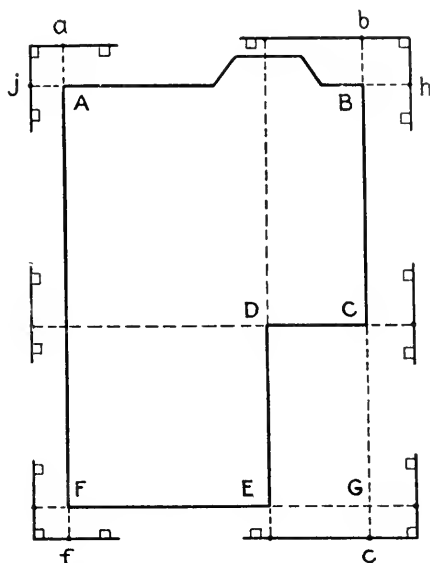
SETTING BATTER-BOARDS FOR A BUILDING.
